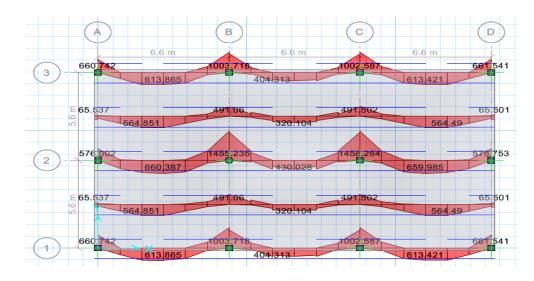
Along longer side reinforcement(SAFE:BS, without staggered column)
